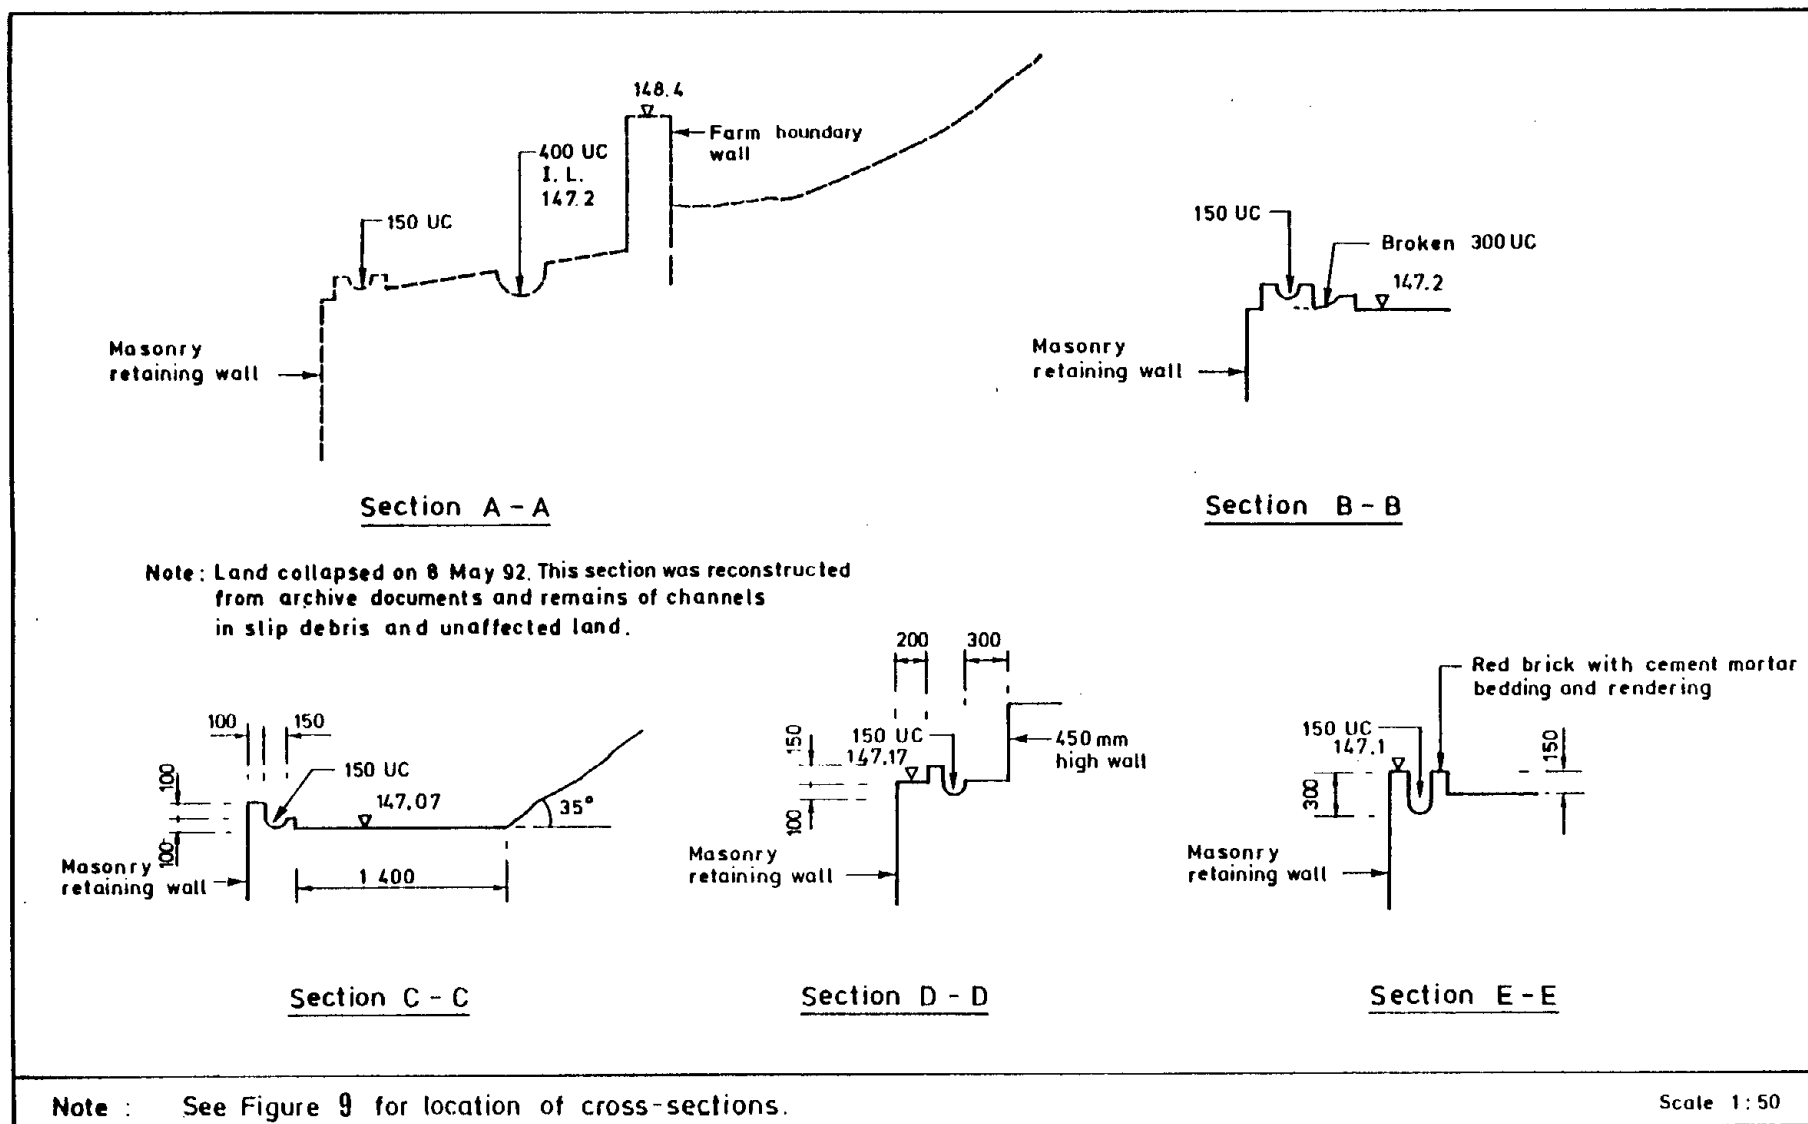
Cross-sections of the Stormwater Drainage System along the Crest Platform
